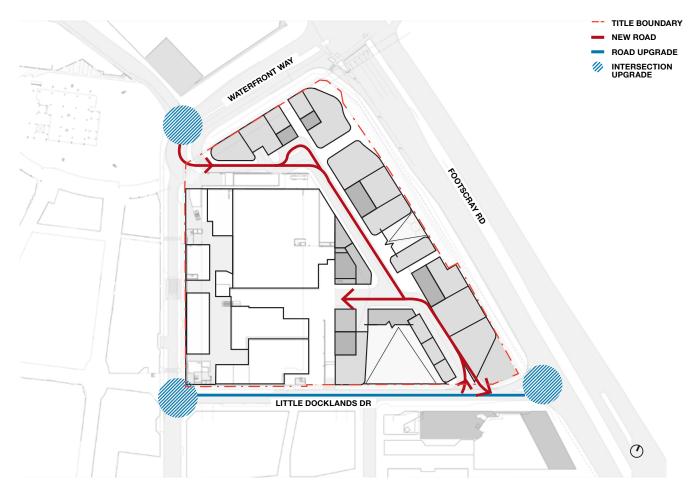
Movement and Parking Plan 7 - Road provision and upgrades
